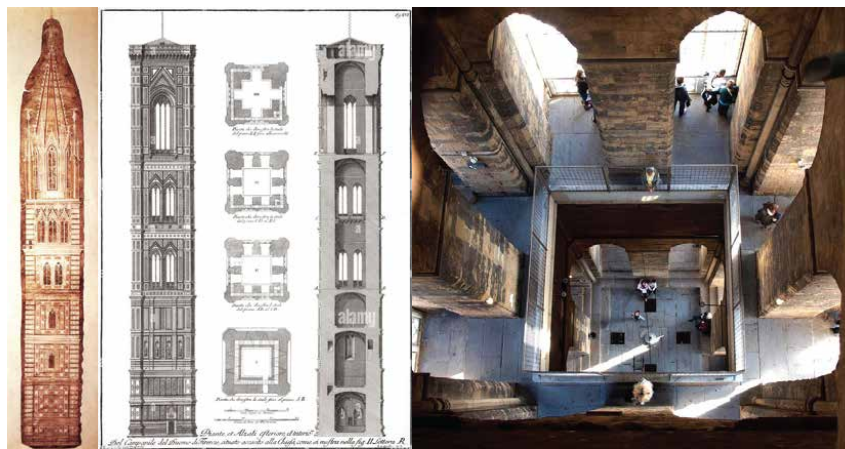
Left: parchment of a design sketch for the Campanile in 1334 (Source: Museo dell'Opera del Duomo, Florence)- Middle: Elevation, floor plans and cross-section after the work of Bernardo Sansone in the 18th c. (Source: Link) - Right: interior photography of the built tower (Source: Link). From design to construction, structural to ornamental elements, the campanile is composed of miscellaneous design instances in temporal layers.
